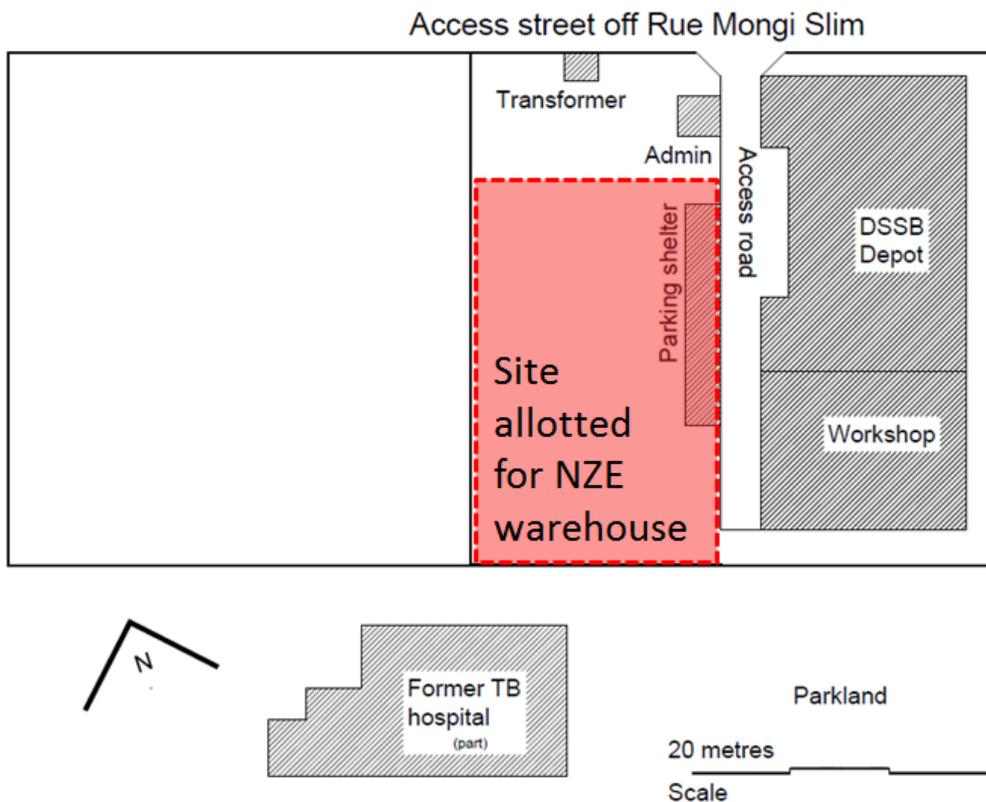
Site plan for the proposed building; Lot adjacent to the DSSB depot; adapted from (Garnett, 2013)
